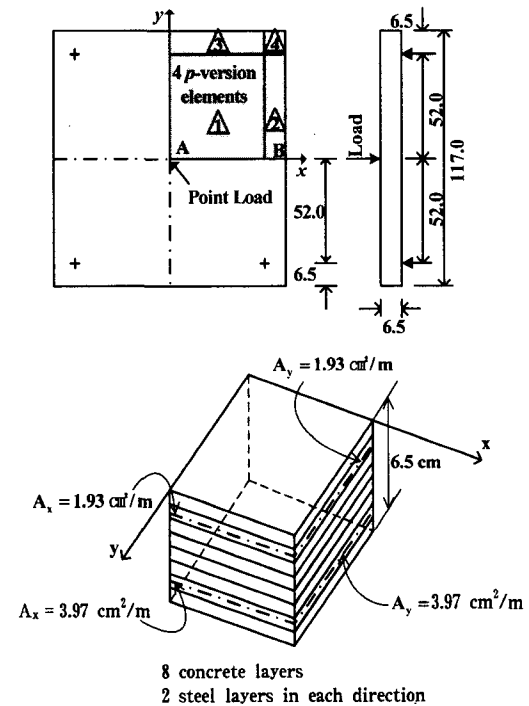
p-Version finite element model of corner supported RC slabs subject to a point load
